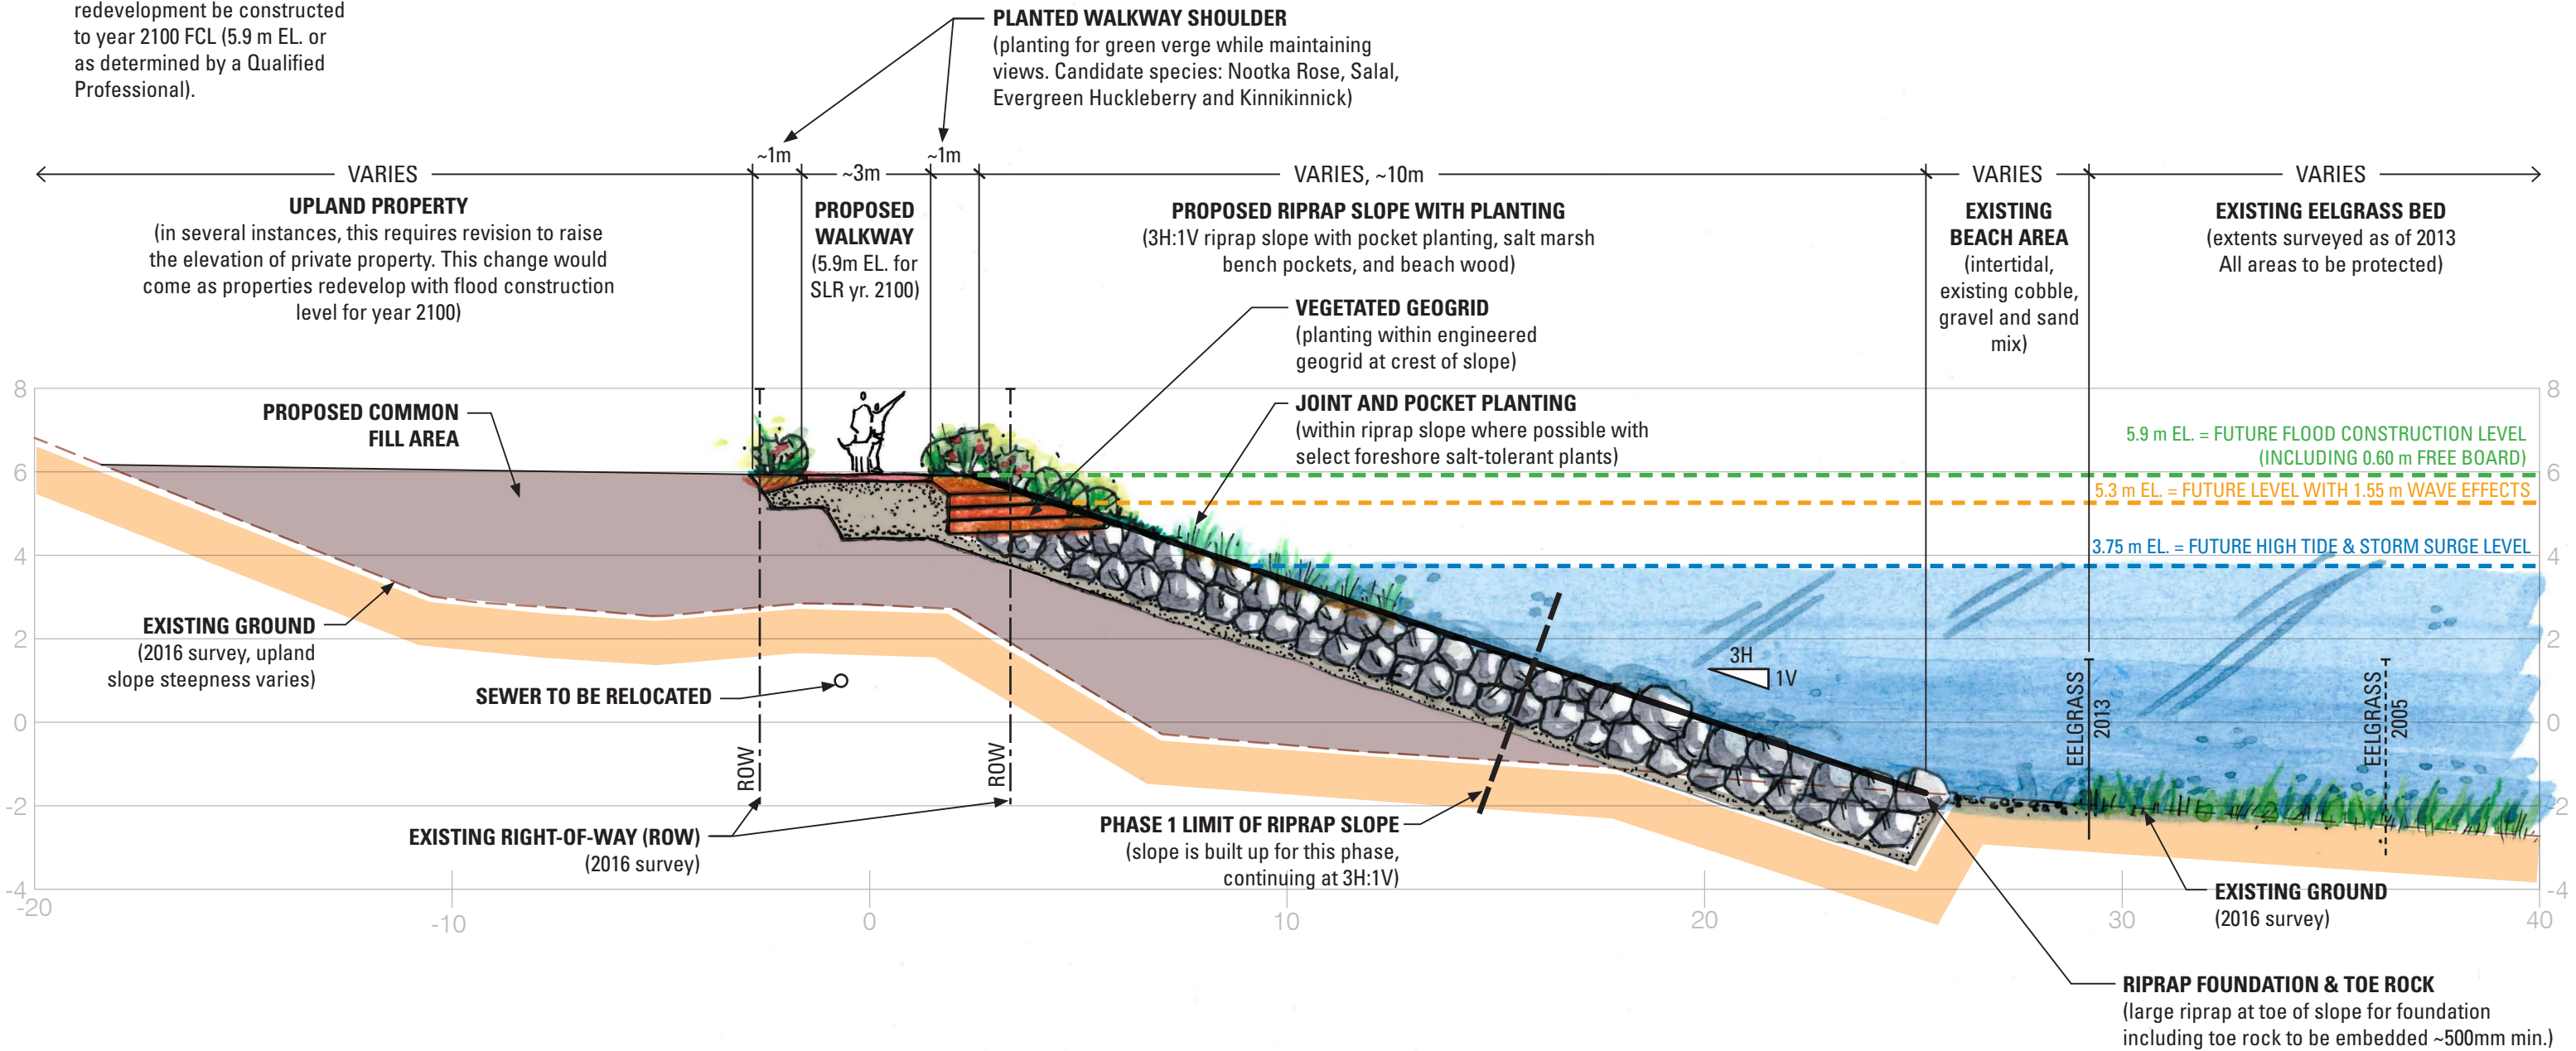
| TYPICAL SECTION - LONG-TERM
